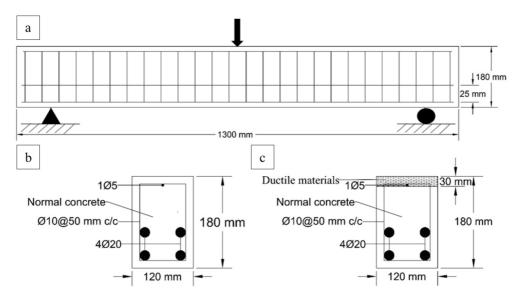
Details of reinforcement and cross-section of over reinforced concrete beams: (a) beam reinforcement; (b) cross section of reference beam; (c) cross section of composite beams
